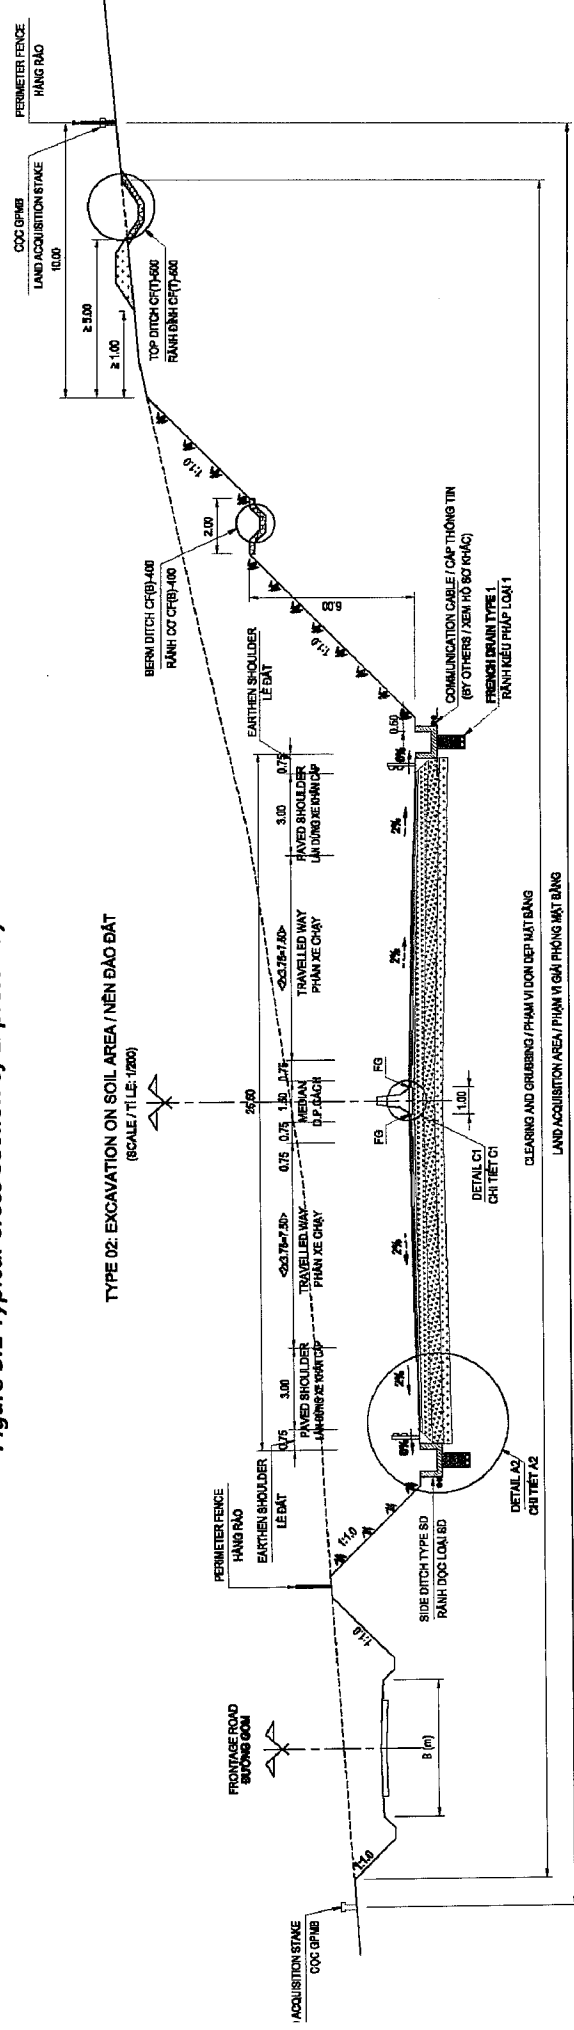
Typical Cross Section of Expressway on Common Excavation
